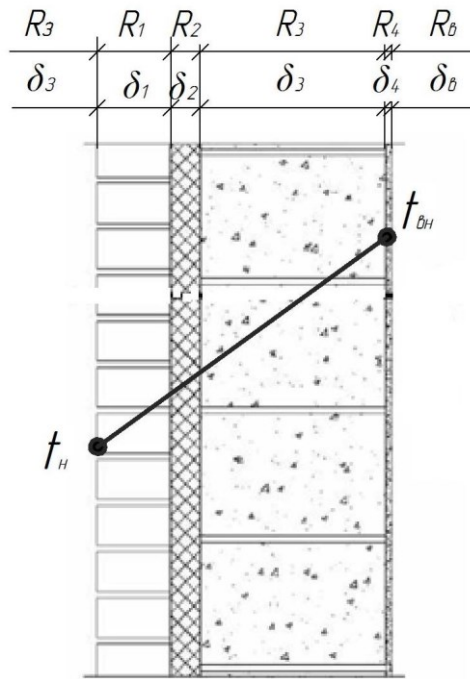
Scheme of heat transfer through the walls with foam blocks
